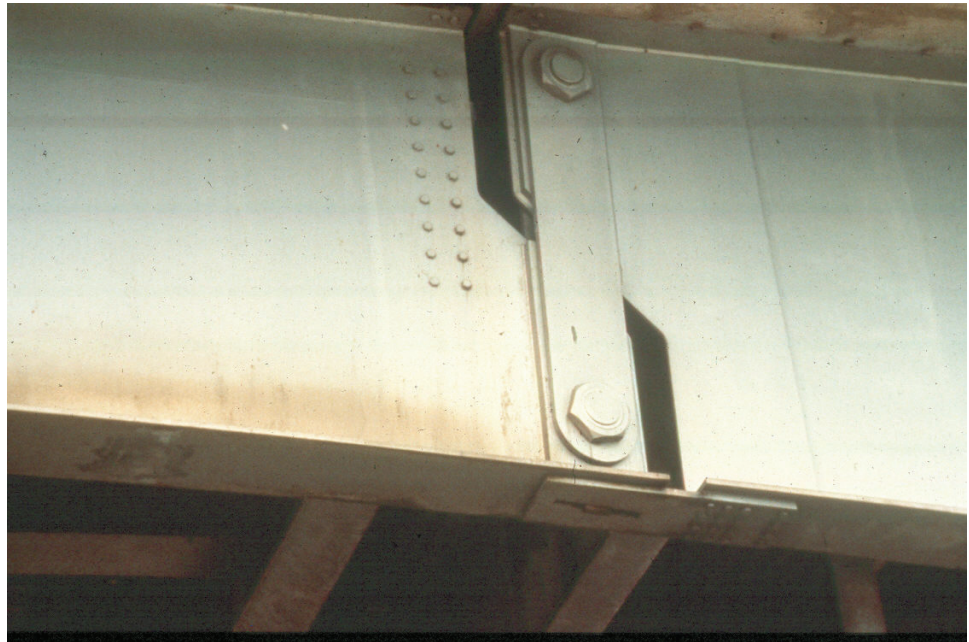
Two Girder Bridge with Pin and Hanger Connection
